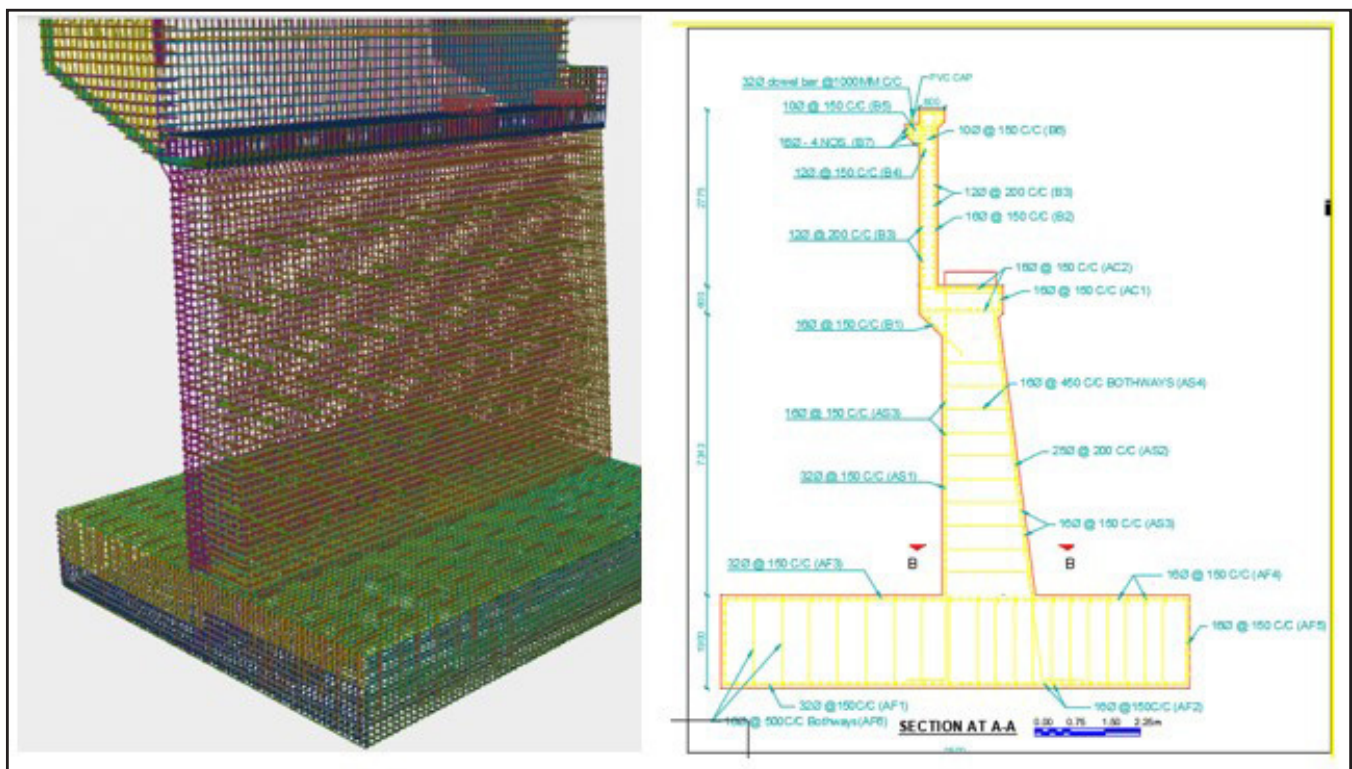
Comparing Bridge Reinforcement Modeling to 2D Reinforcement Drawings
